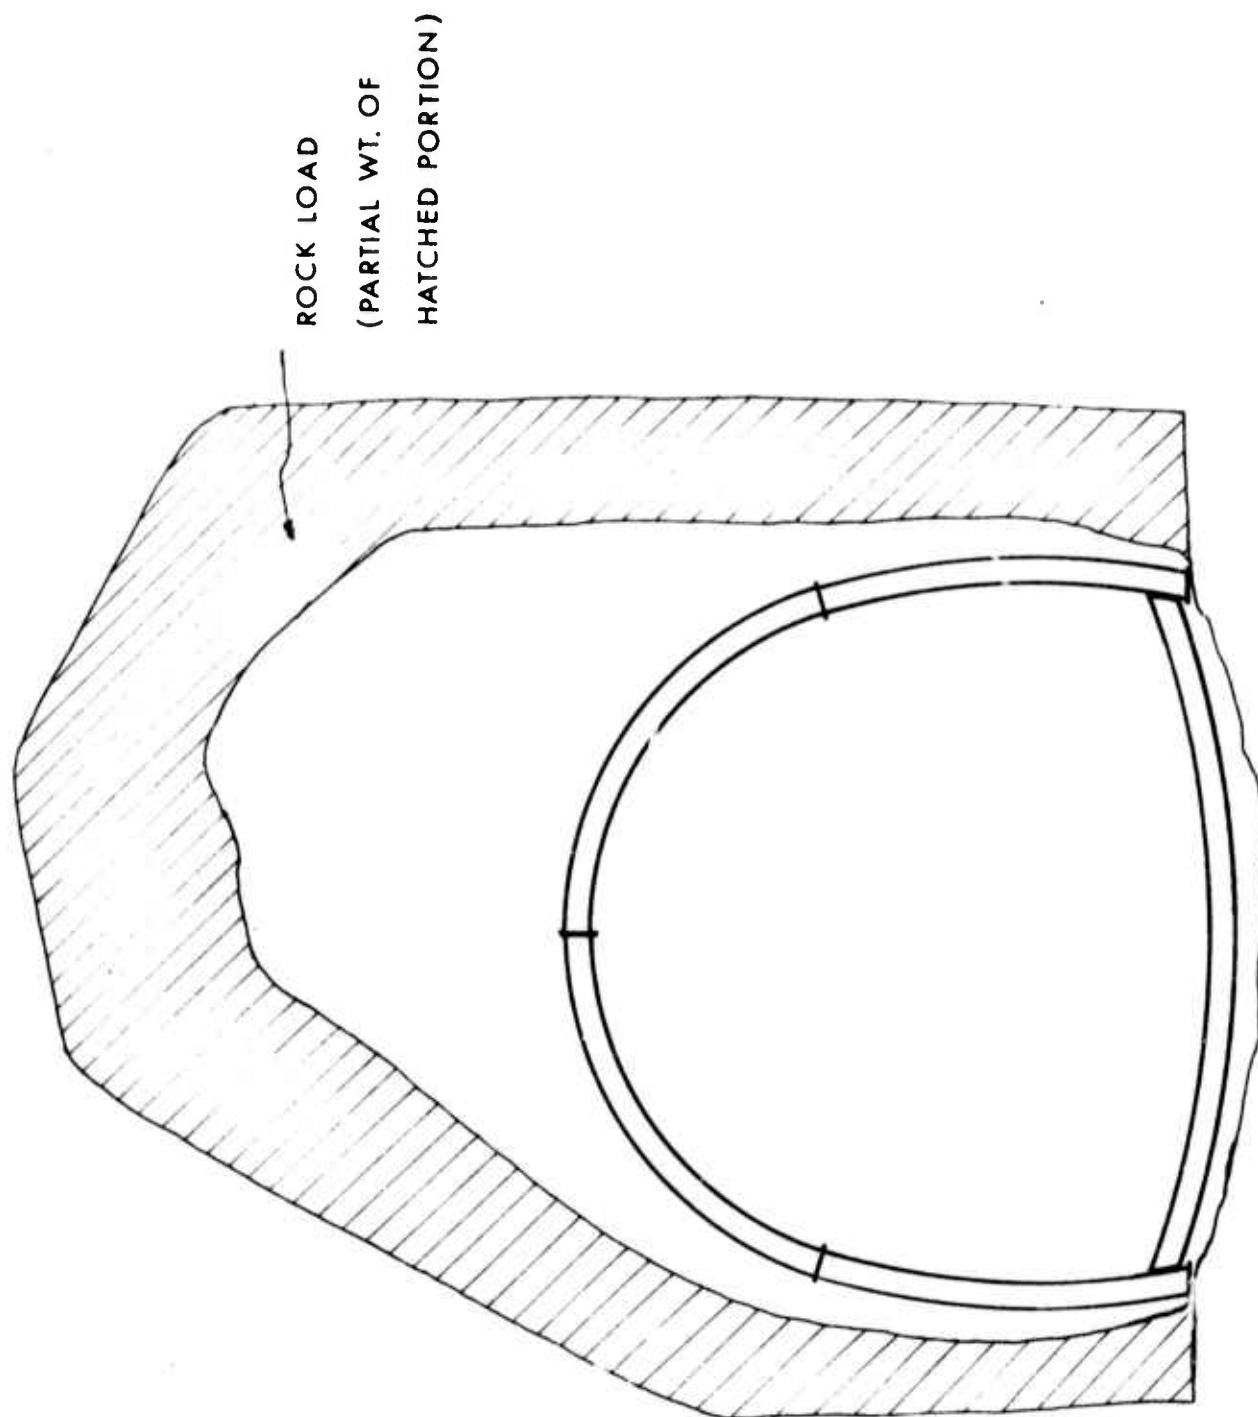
Tunnel Cross-Section Showing Rock Load for Case c
